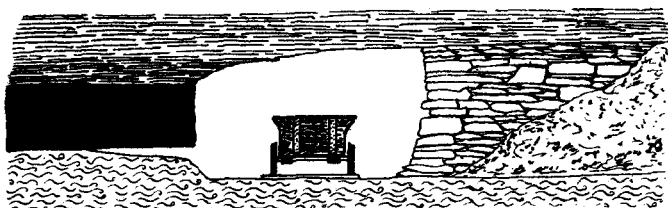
Section at face in long wall mining with strong roof, showing position of track, gob wall, etc.
